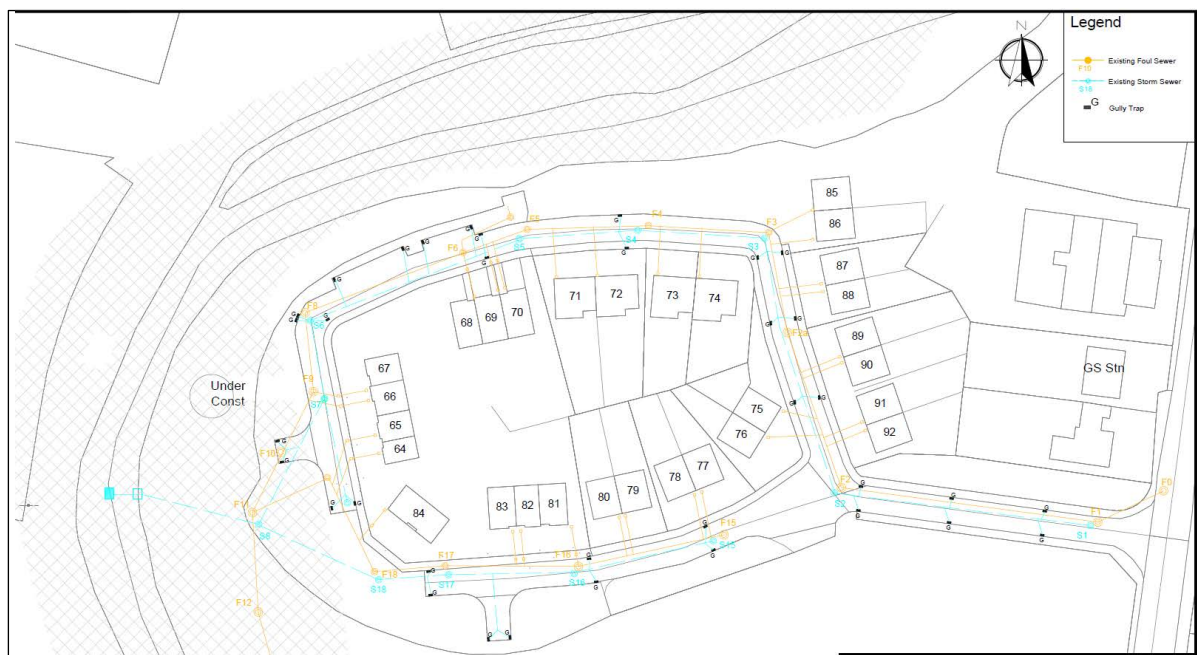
Existing drainage layout for connection of FWD and SWD¹⁵
